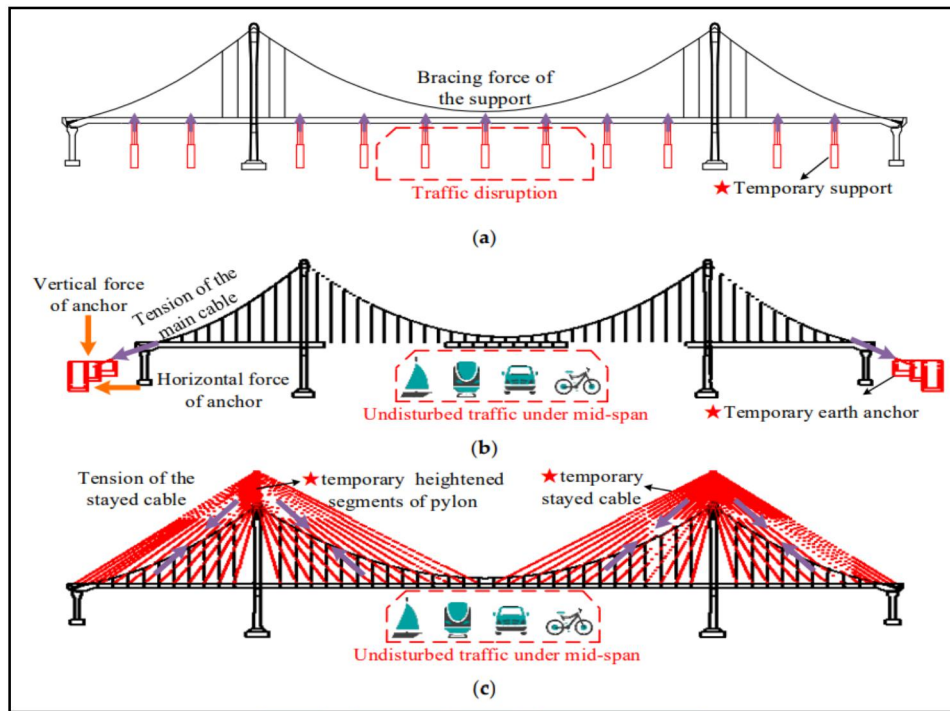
Traditional construction technologies for self-anchored suspension bridge: (a) Temporary supports technology; (b) temporary earth-anchor technology ; and (c) temporary stayed-cables technology.
